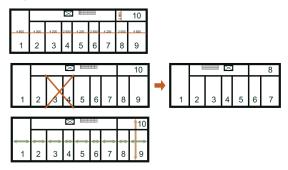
Modifying a timber apartment building's floor plan using variations in modular elements
